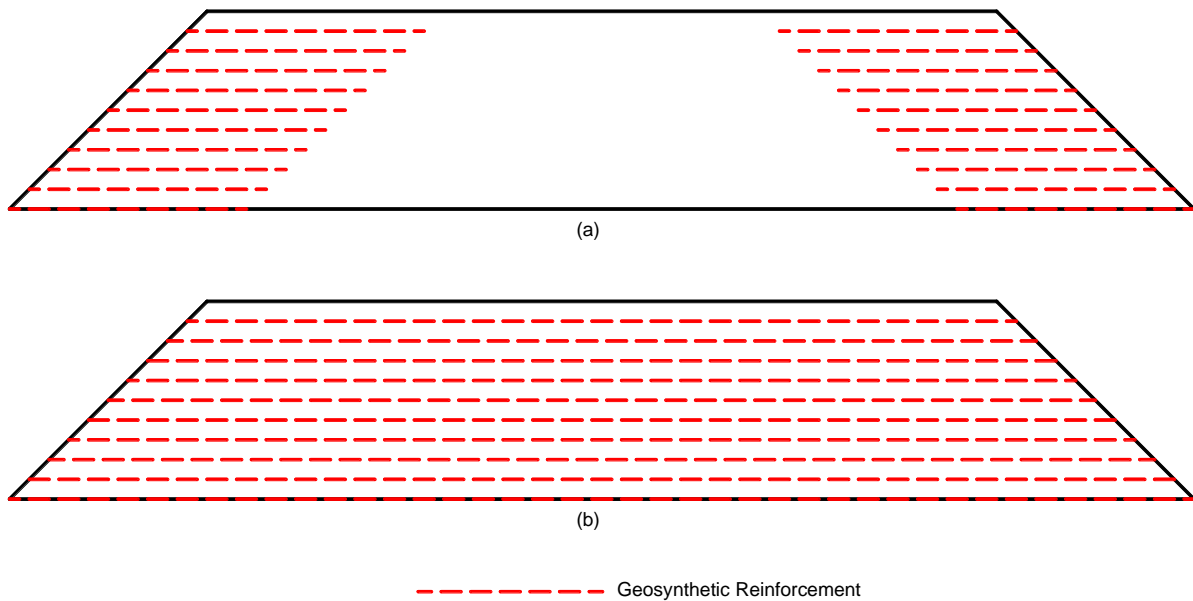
Reinforcement arrangement for analysis: a. reinforcement length is as $L=6\text{m}$, b. geosynthetic reinforcement stretching from side to side ($L=\text{slope lengths}$)
